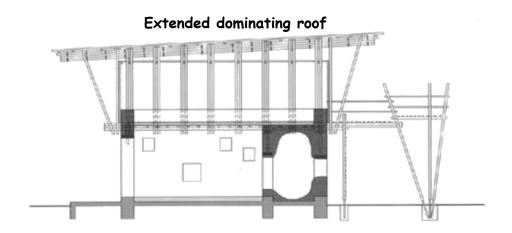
SECTION: Replication of Bengal Architecture; (ArchDaily, 2010)
